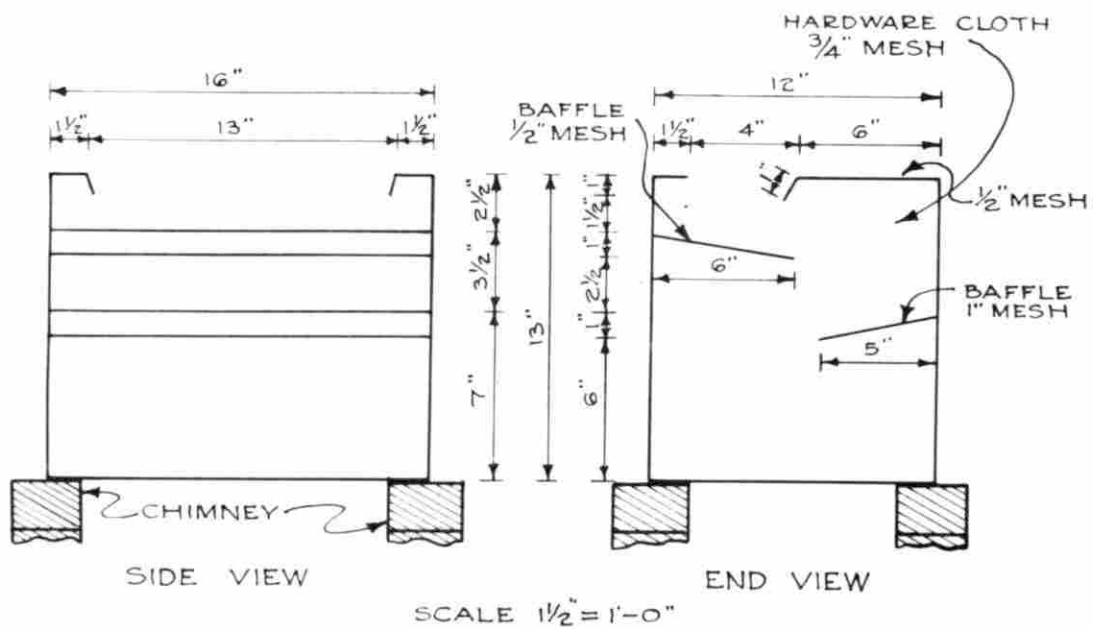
SECTIONAL SKETCH OF NO. 8 SPARK ARRESTER
